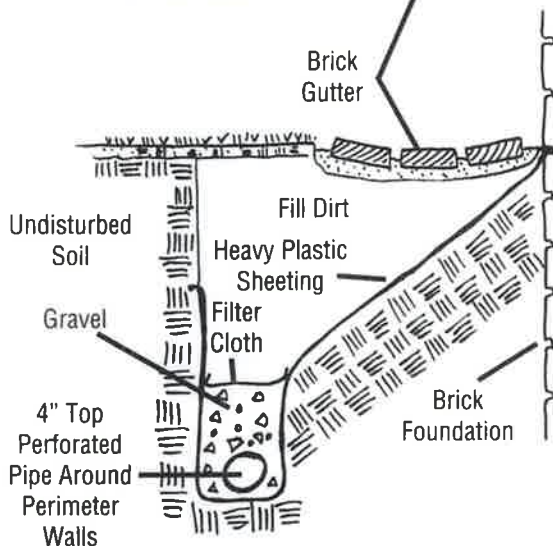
This detail drawing shows a sub-surface perimeter drain in conjunction with a historic brick ground gutter system to help control roof run-off moisture from entering the historic foundation. Detail: Courtesy, Gunston Hall Plantation. Photo: Elizabeth Sasser.
